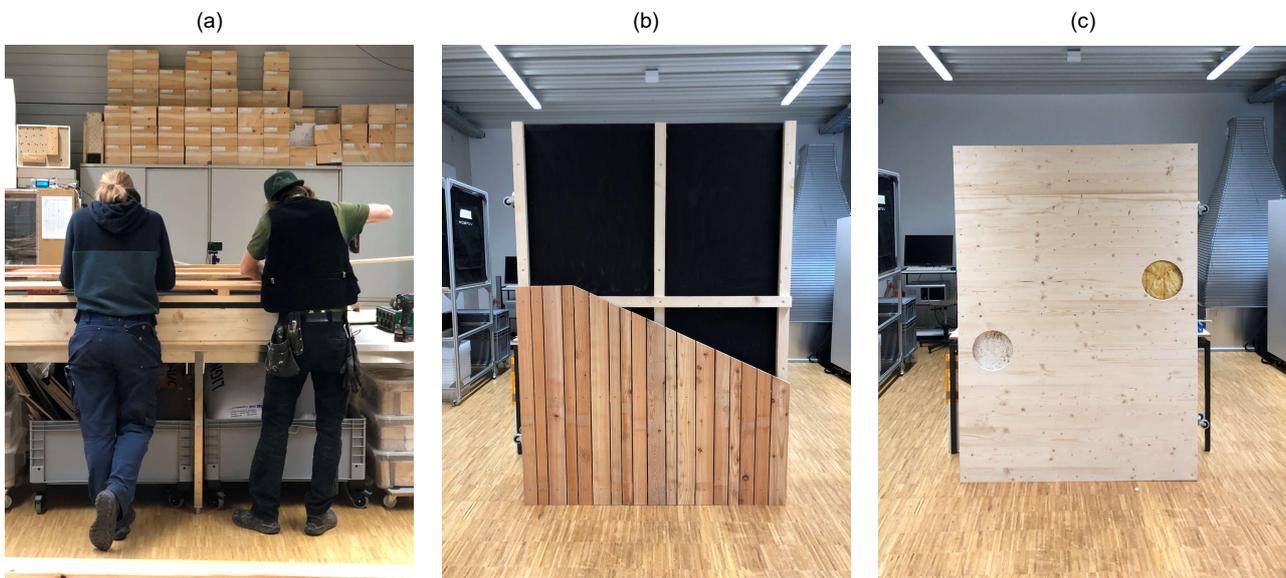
(a) project partner team finishing up the wall, (b) façade with larch cladding; (c) interior side of the wall with two controlling openings.
